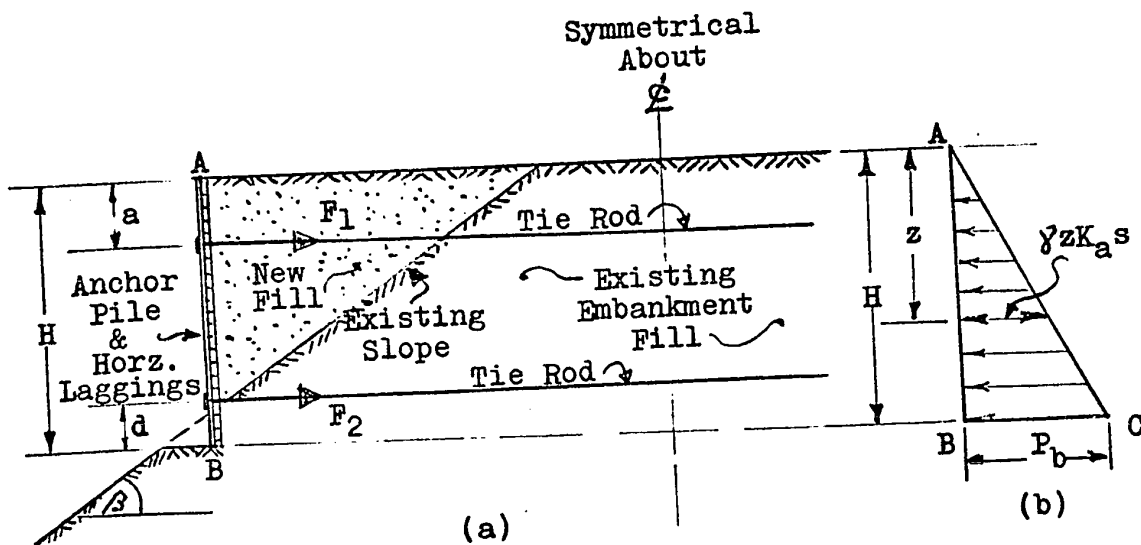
(a) Cross-section of typical retaining wall system,
